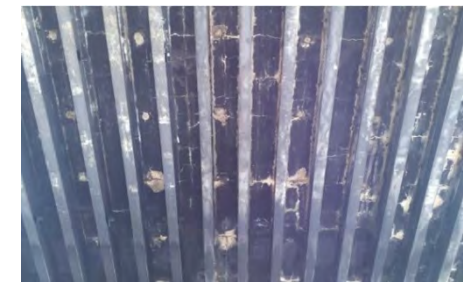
Spalls at Span 3 between Girders 8-14
